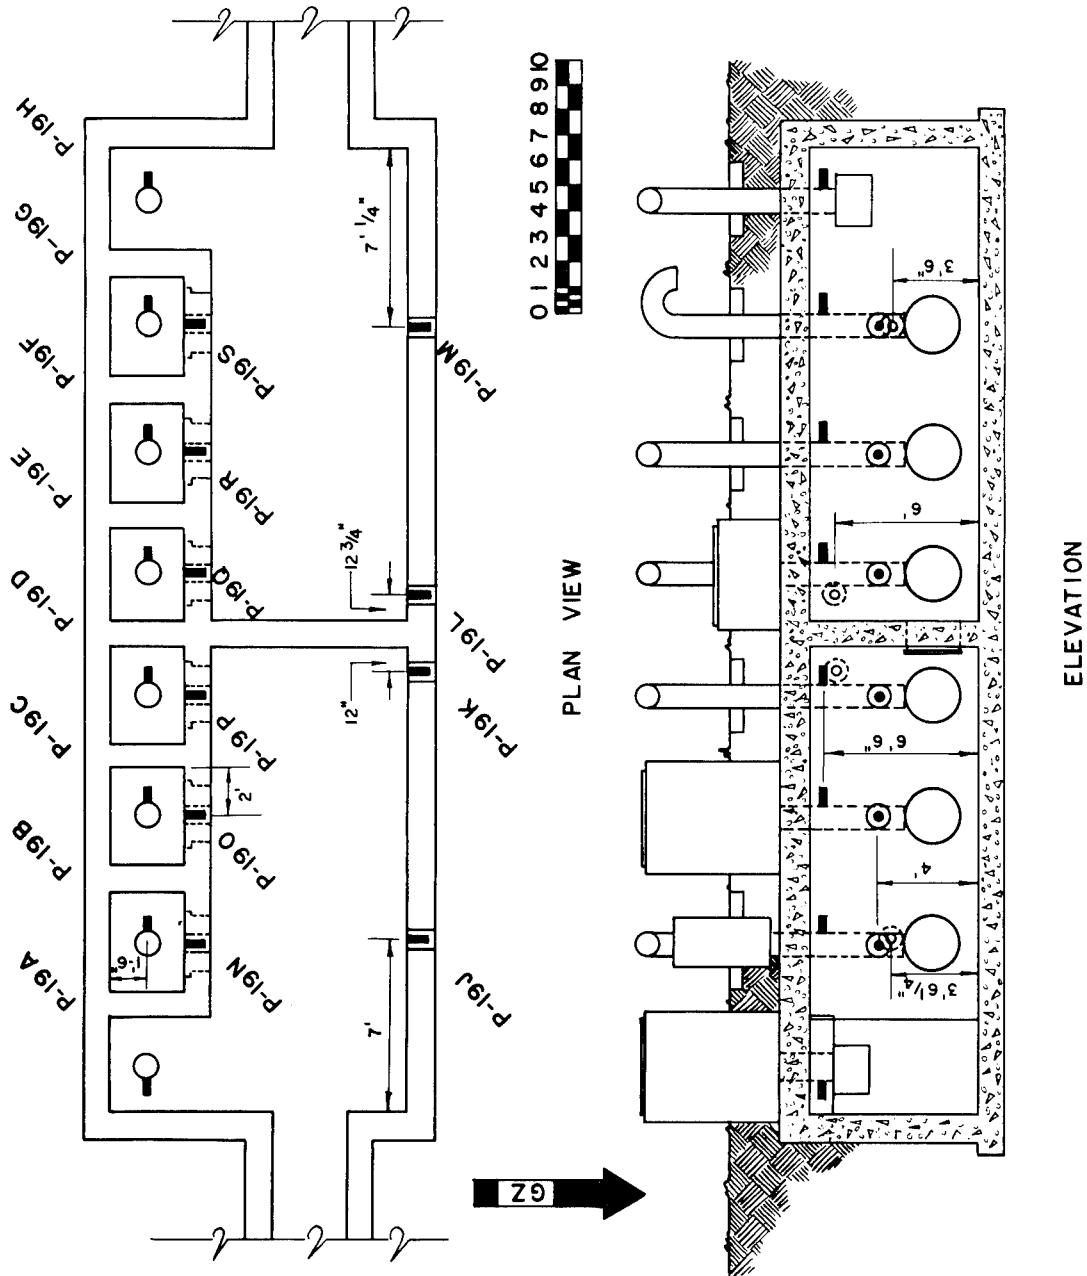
Gage Layout for 3.7 Structure, Vents and Plenum Chambers
